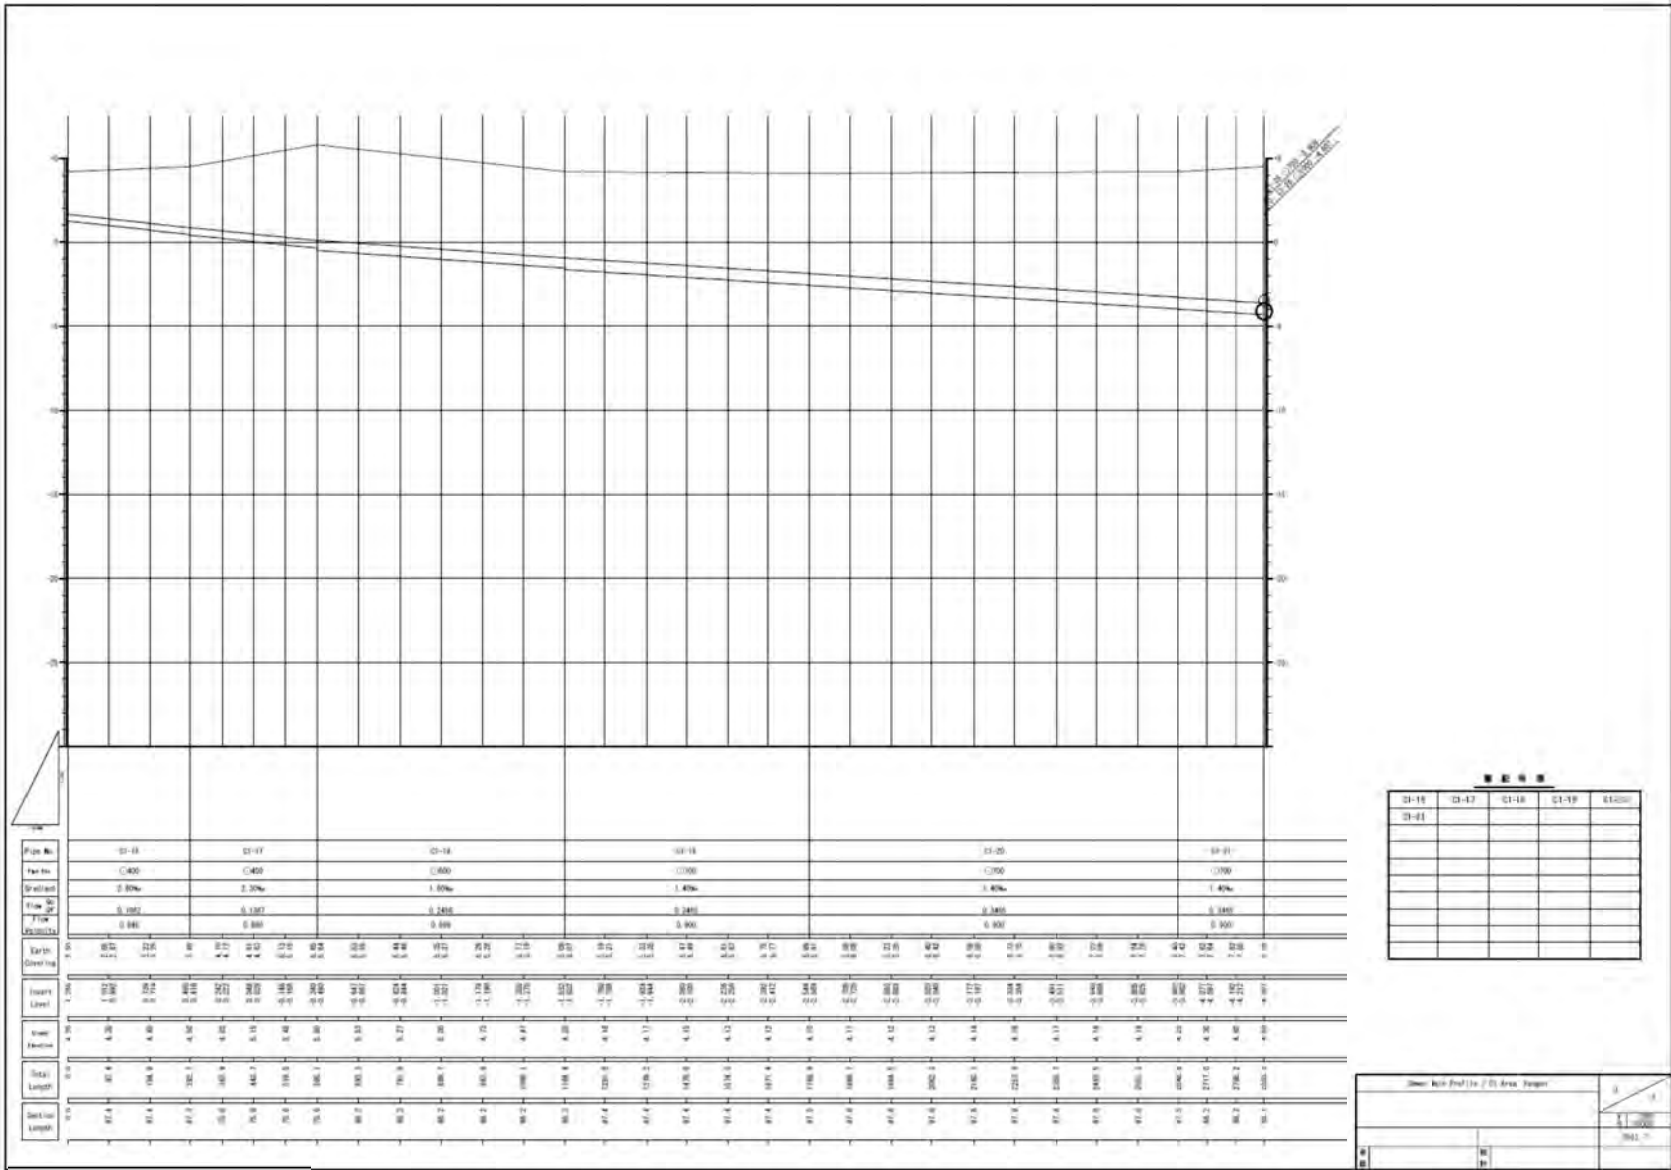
Trunk Main Profile in C1 Sewerage Zone (1/5)
